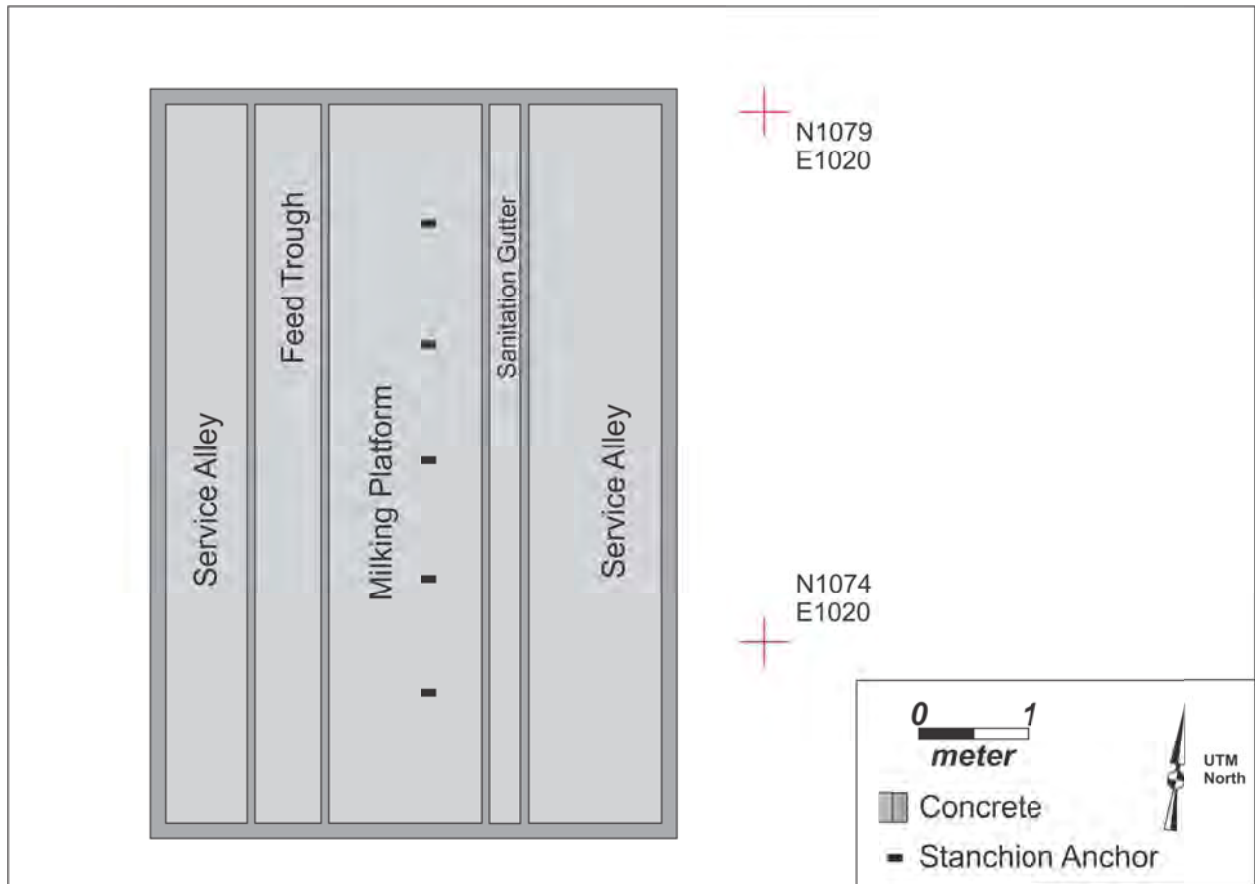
Illustration of the South Shyville milking parlor foundation (Structure #2).
